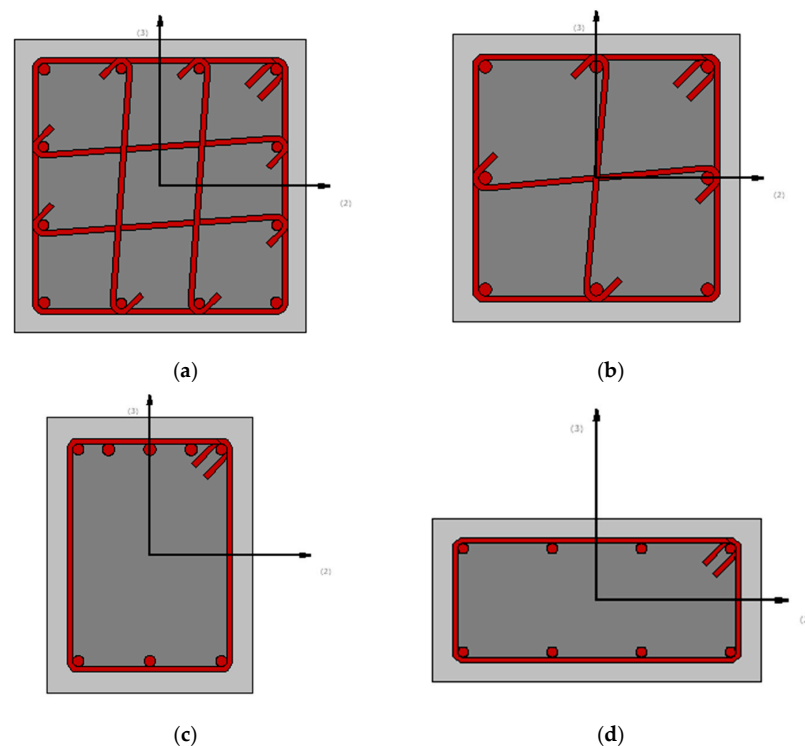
RF element cross-section: (a) 1–2–3 floors; (b) 4–5 columns; (c) perimetral and (d) internal beam.
